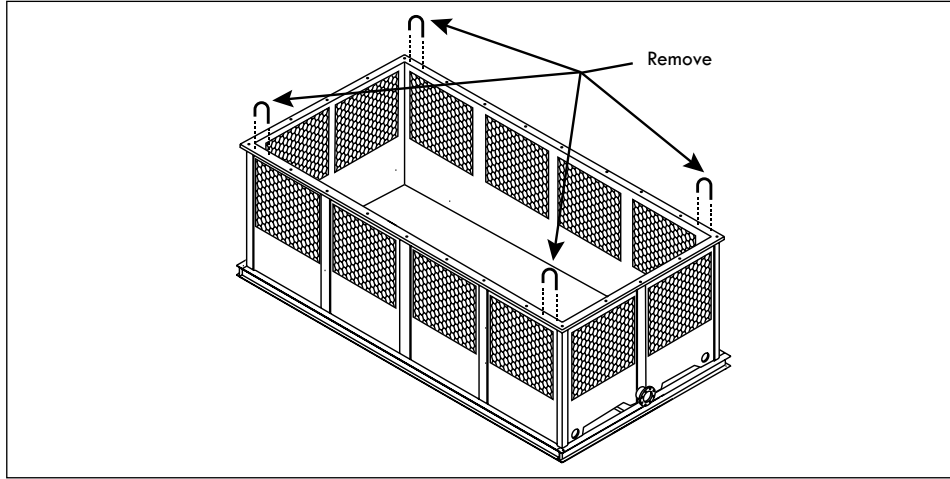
Removing U-bolts from basin for a Two Fan Tower
